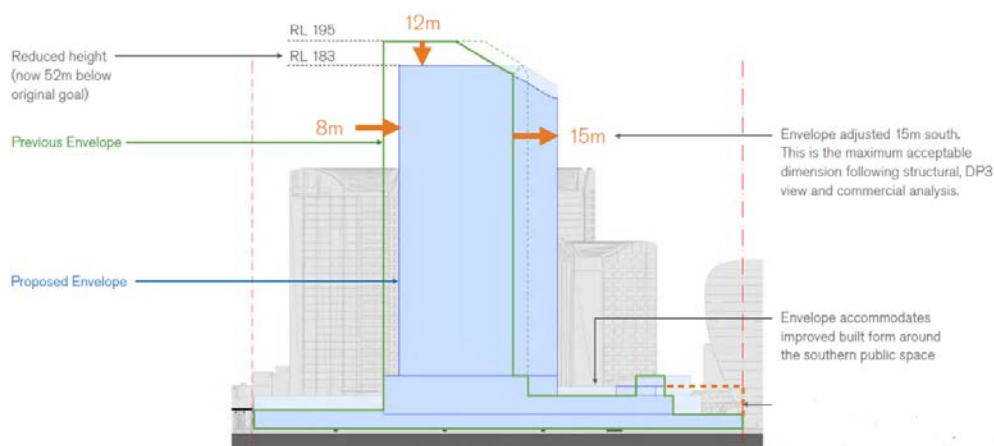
Amendments to proposed Concept Envelope (western elevation)
